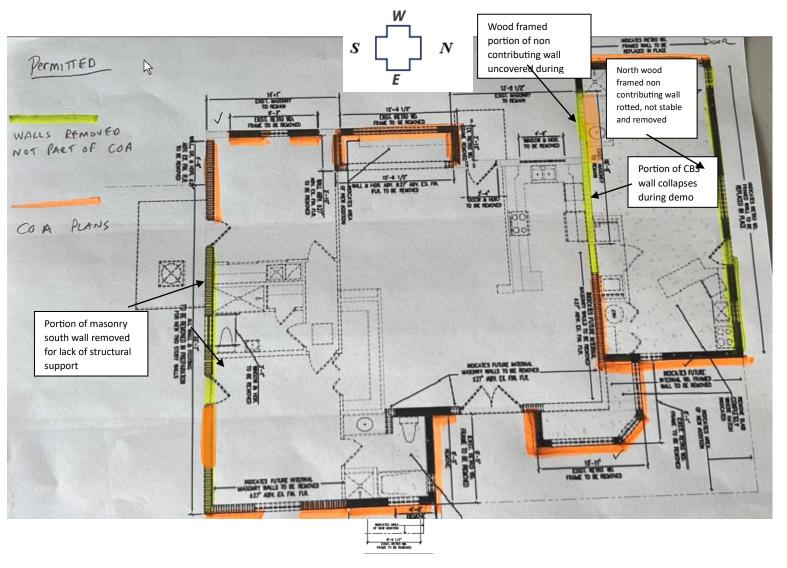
Exhibit B – Demo plan executed based on permitted plans including 3 areas not approved for demolition as part of the Demo planned submitted and approved 2022 COA HPB.
